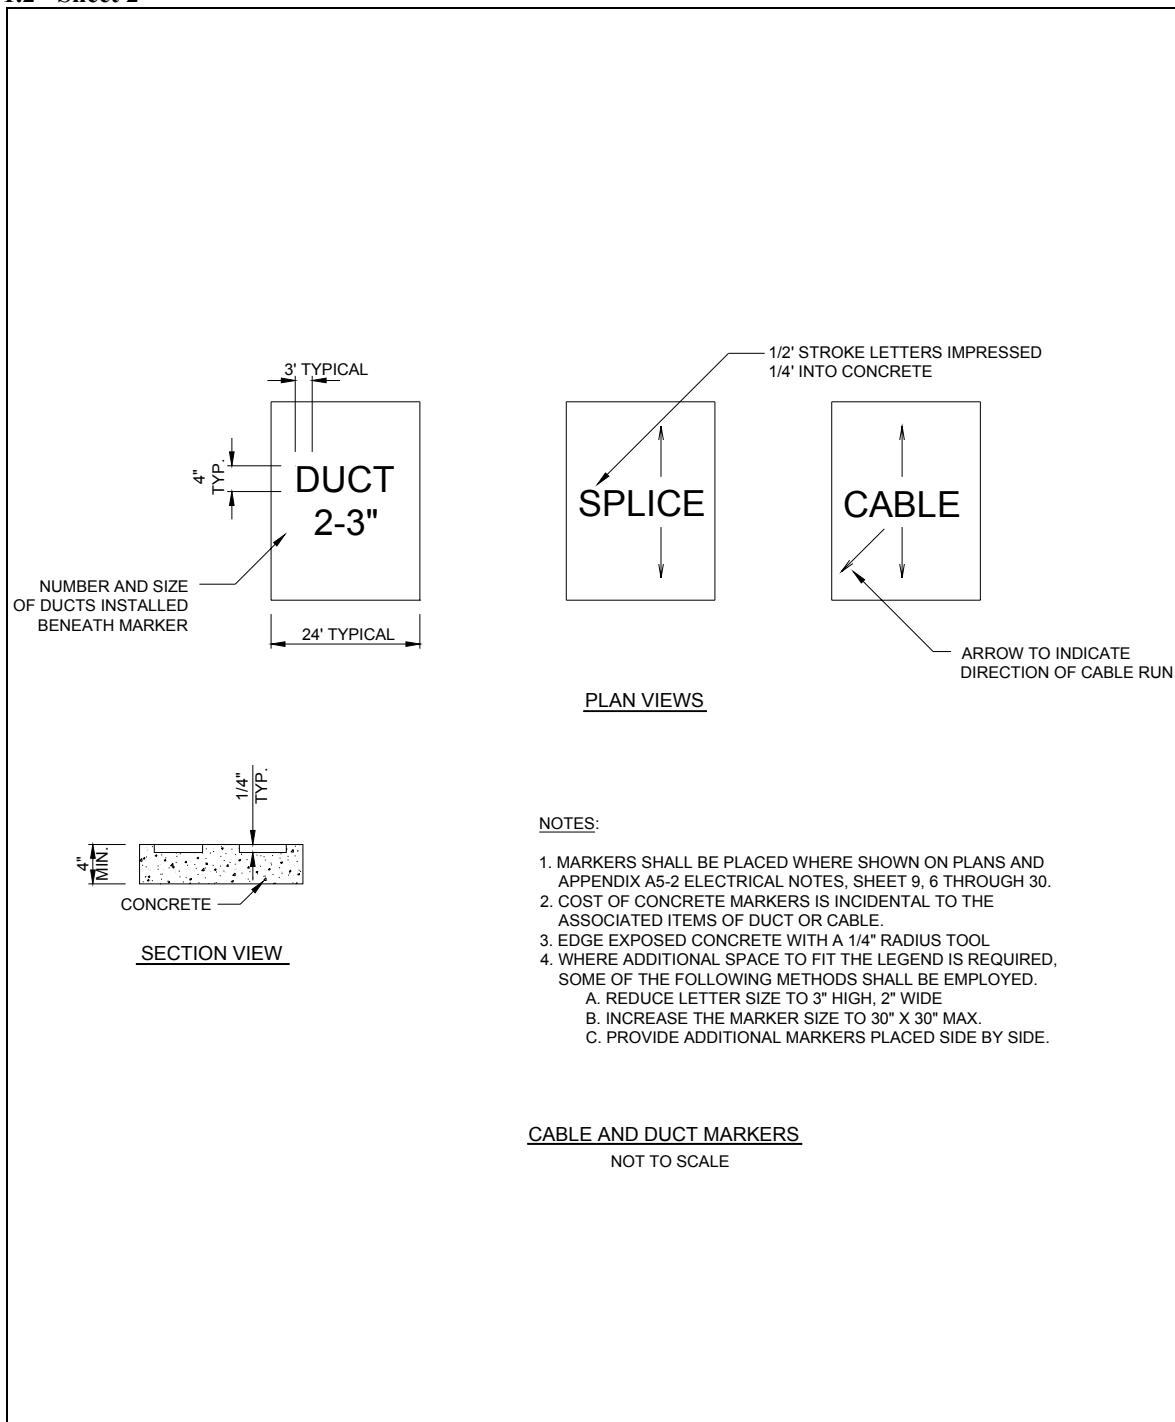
Standard Details for Underground Cable Installation – GL-600 Sheet 2A – Cable and Duct Markers
